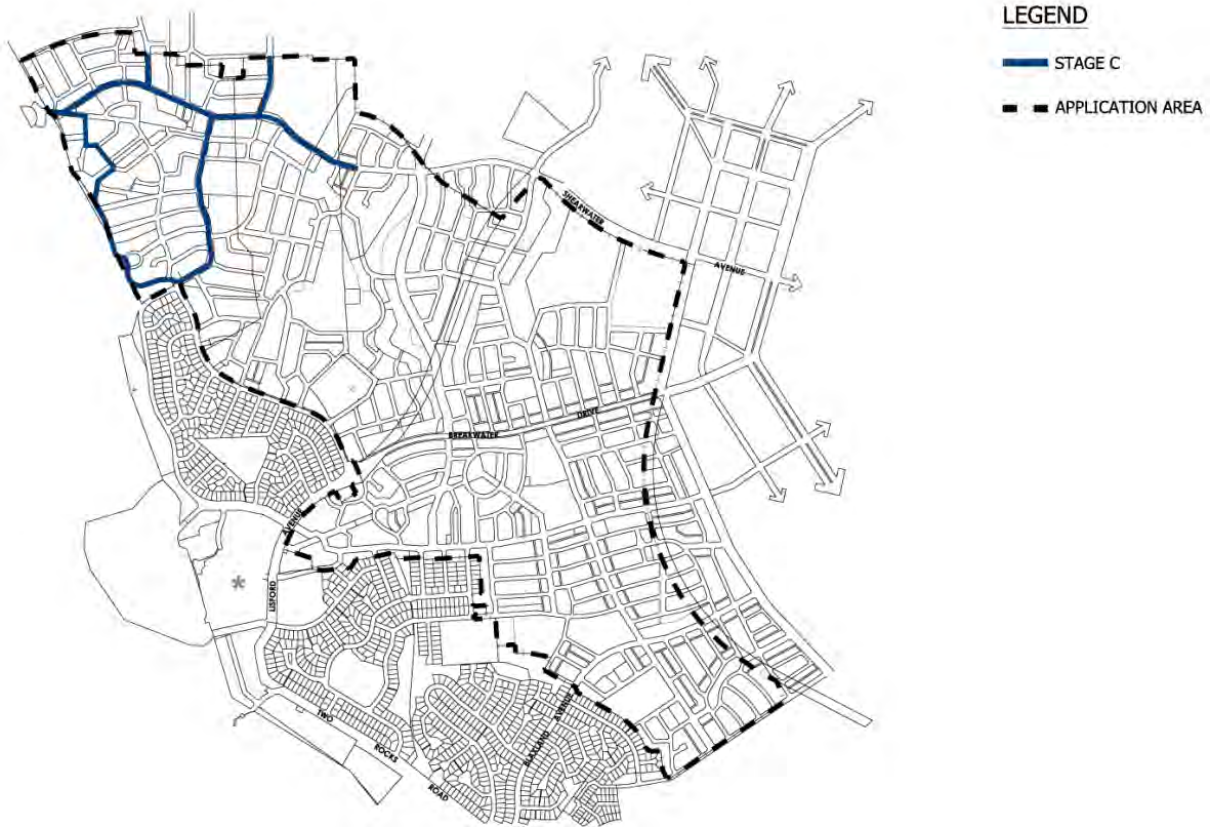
STAGE C MAJOR ROAD CONSTRUCTION [SOURCE: SKM]
